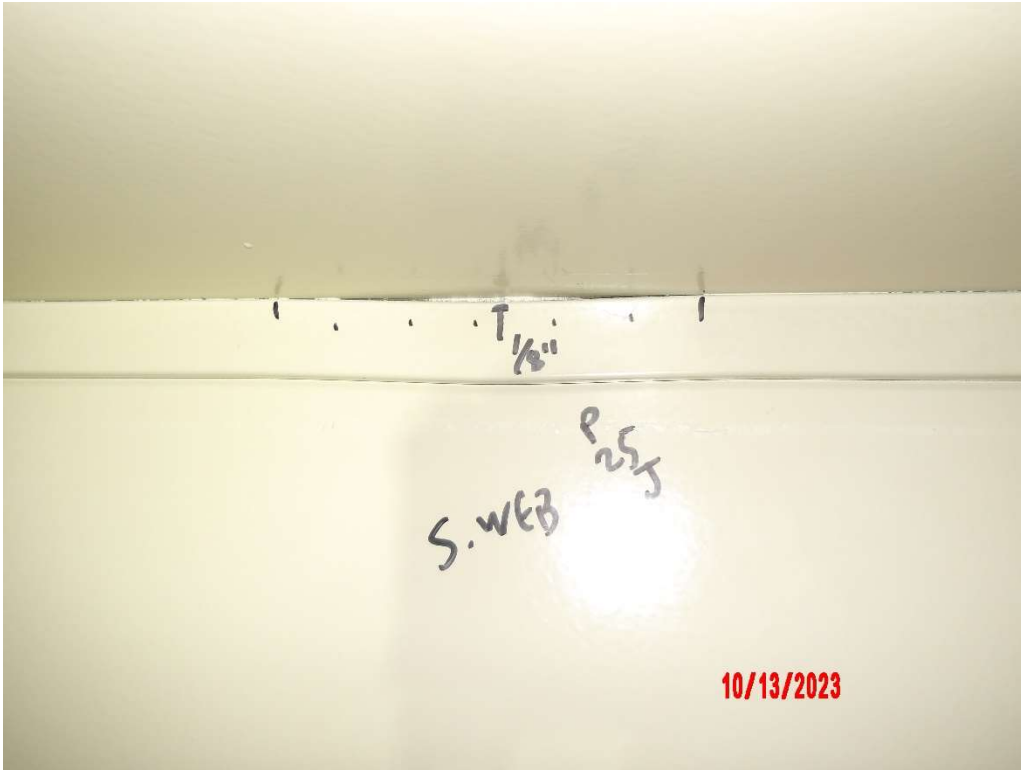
Pier 25J, South Face, Deformed Backing Plate, 6" L x 1/8" D
